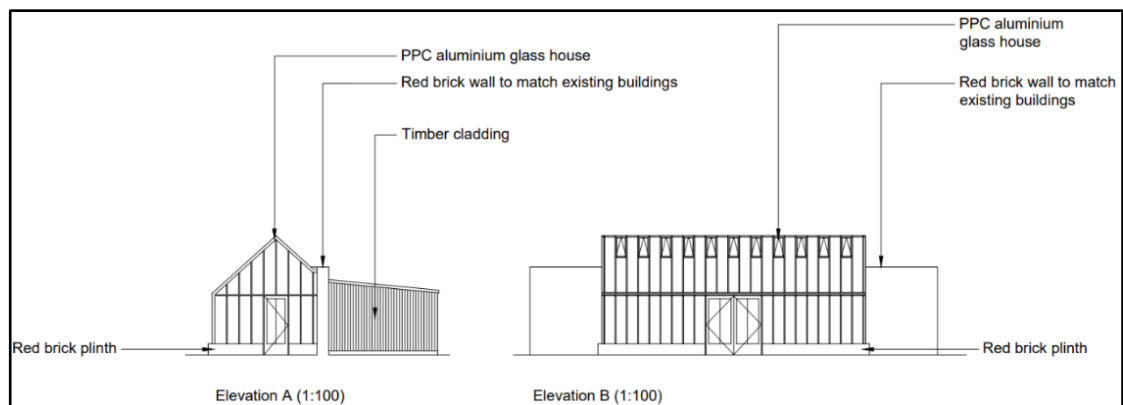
PROPOSED ELEVATIONS OF GREENHOUSE AND ASSOCIATED STORE (CLAGUE ARCHITECTS)
